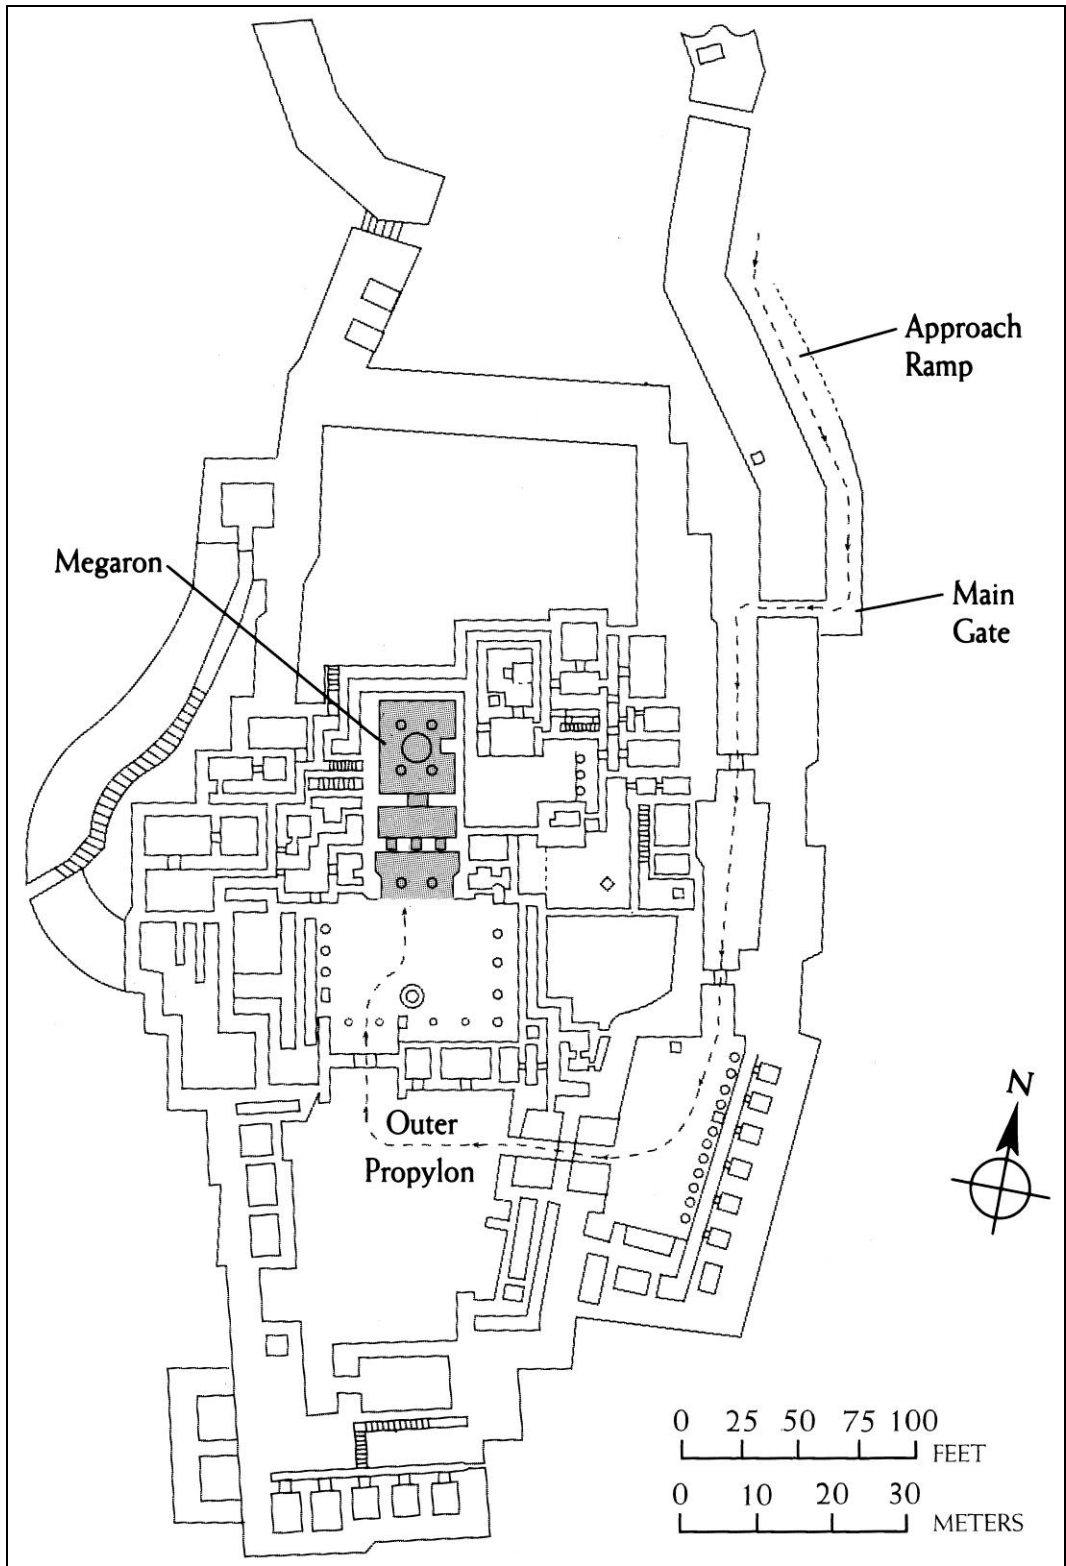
Plan of the Palace at Tyrins (Animoart, n.d.)
